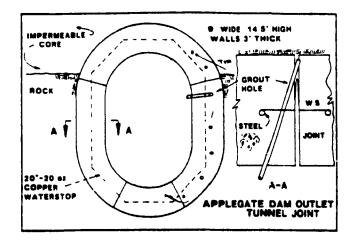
WATERSTOP REPAIRS IN JOINTS AT APPLEGATE DAM OUTLET TUNNEL<sup>28</sup>
